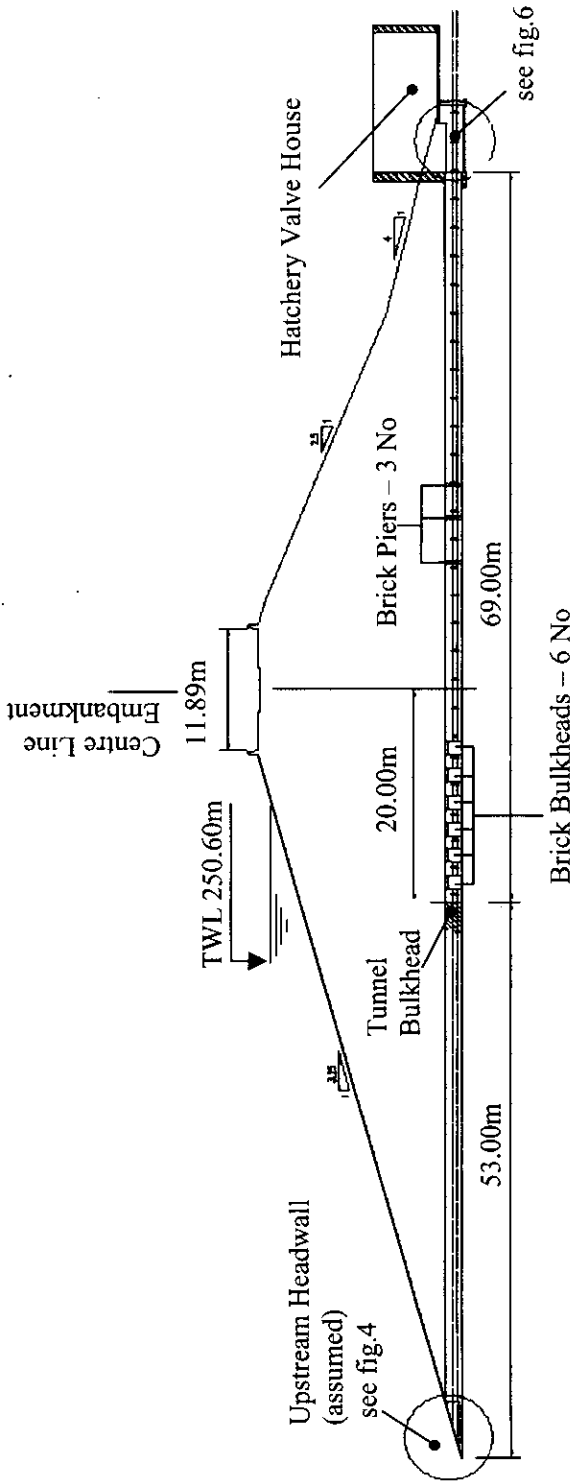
Longitudinal Section Through Embankment and Masonry Tunnel
